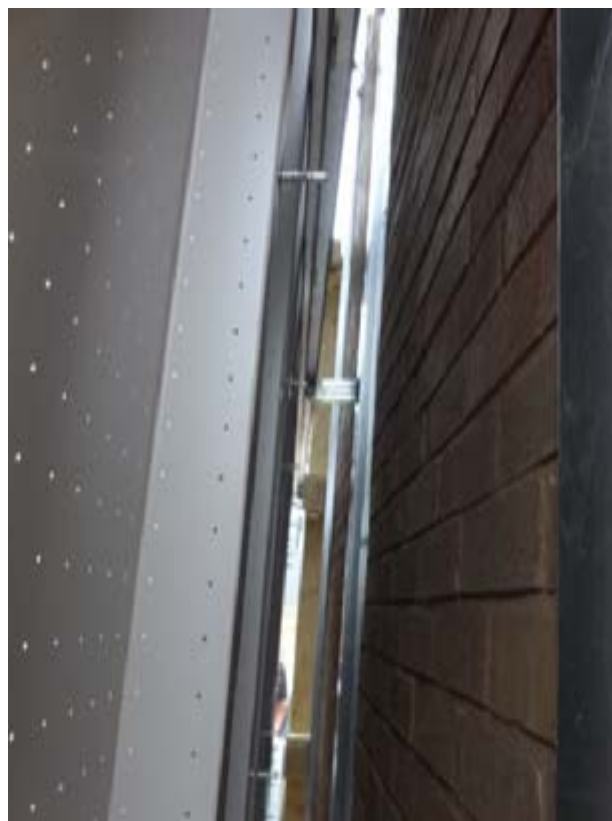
Spacing of the brackets behind the TSC panel on the Glan Clwyd school TSC elevation.
